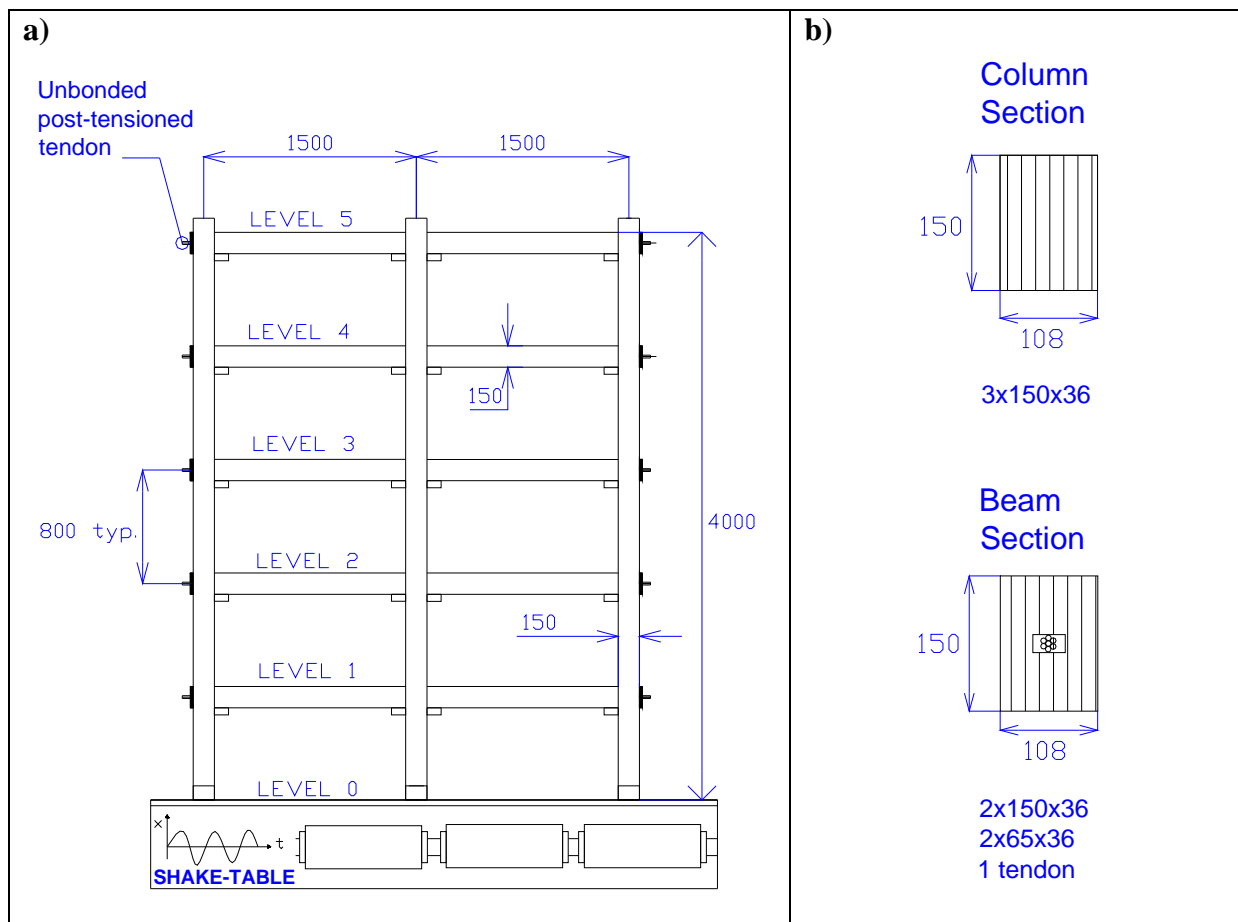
a) Model building global dimensions b) Beam and column cross section (units mm)
